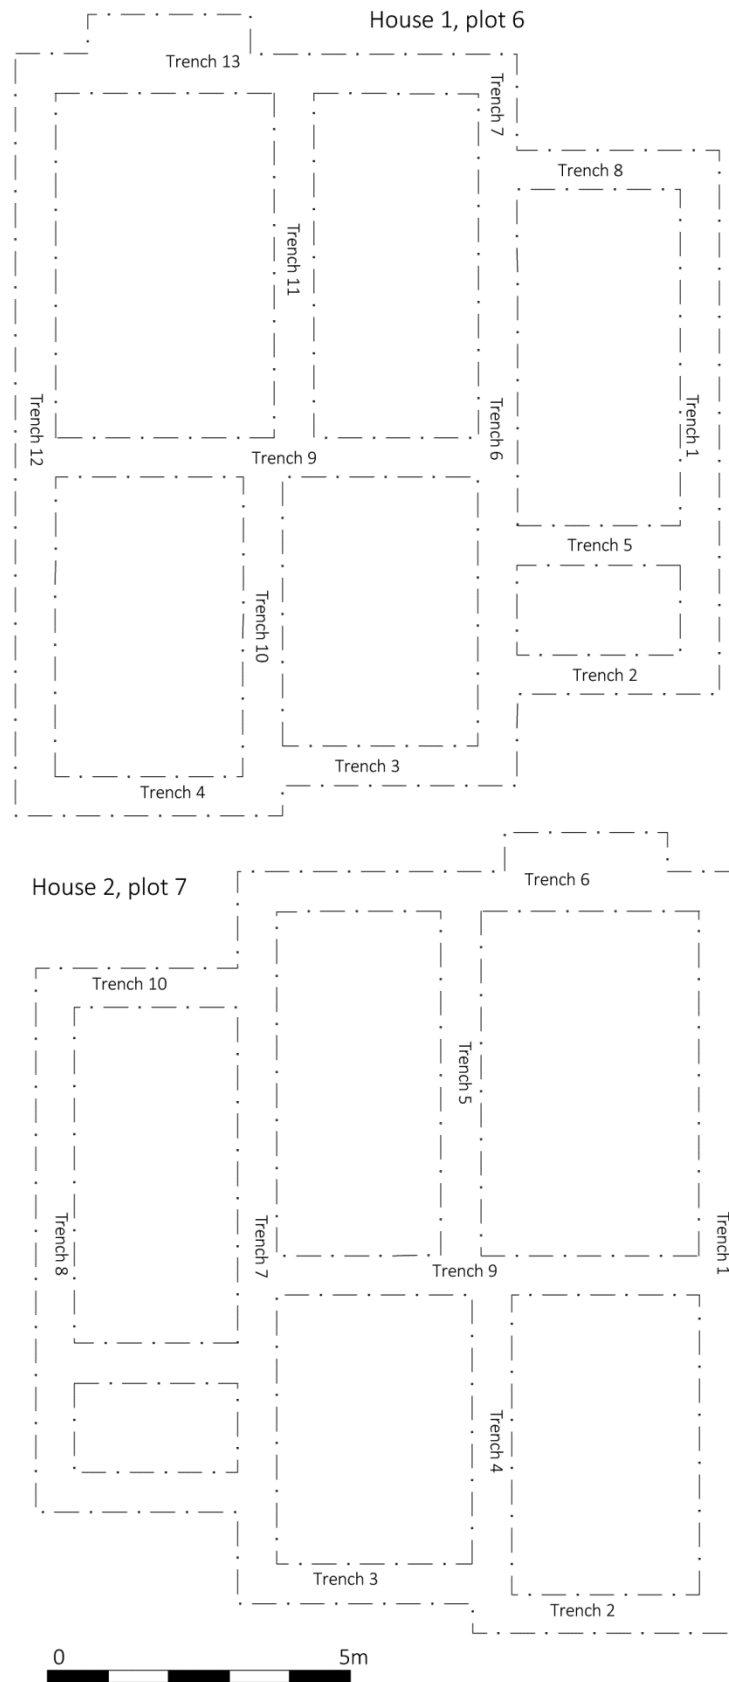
Footing trench plan for Plots 6-7 (scale 1:125). See Fig. 4 for location
